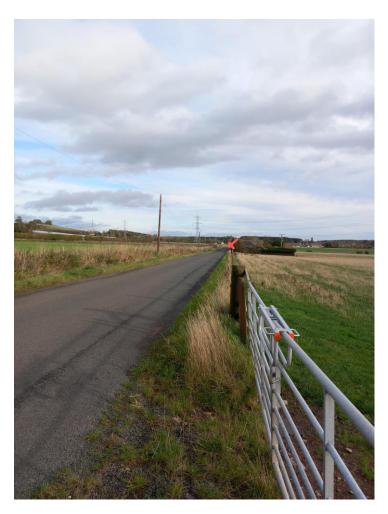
Looking 215Metres in Easterly direction, towards Memus, from access to proposed site
